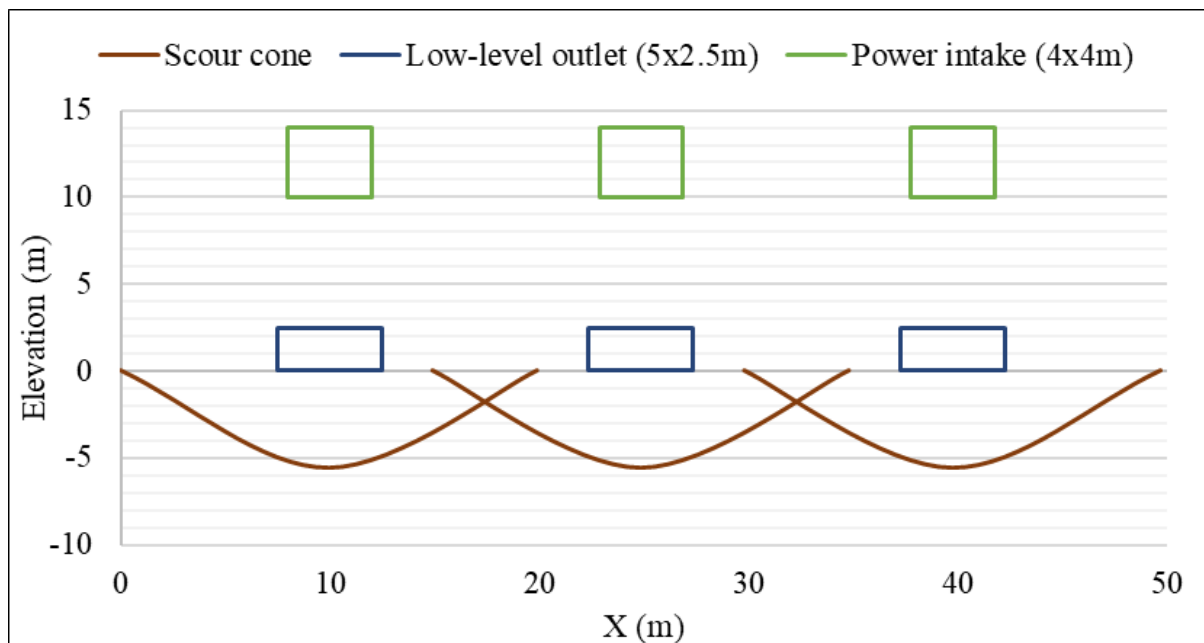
Elevation view of proposed layout of intake and outlet works
